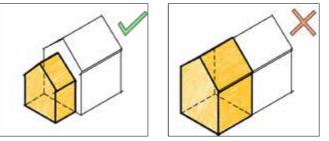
How to ensure that extensions are subservient to the scale and form of the original dwelling
